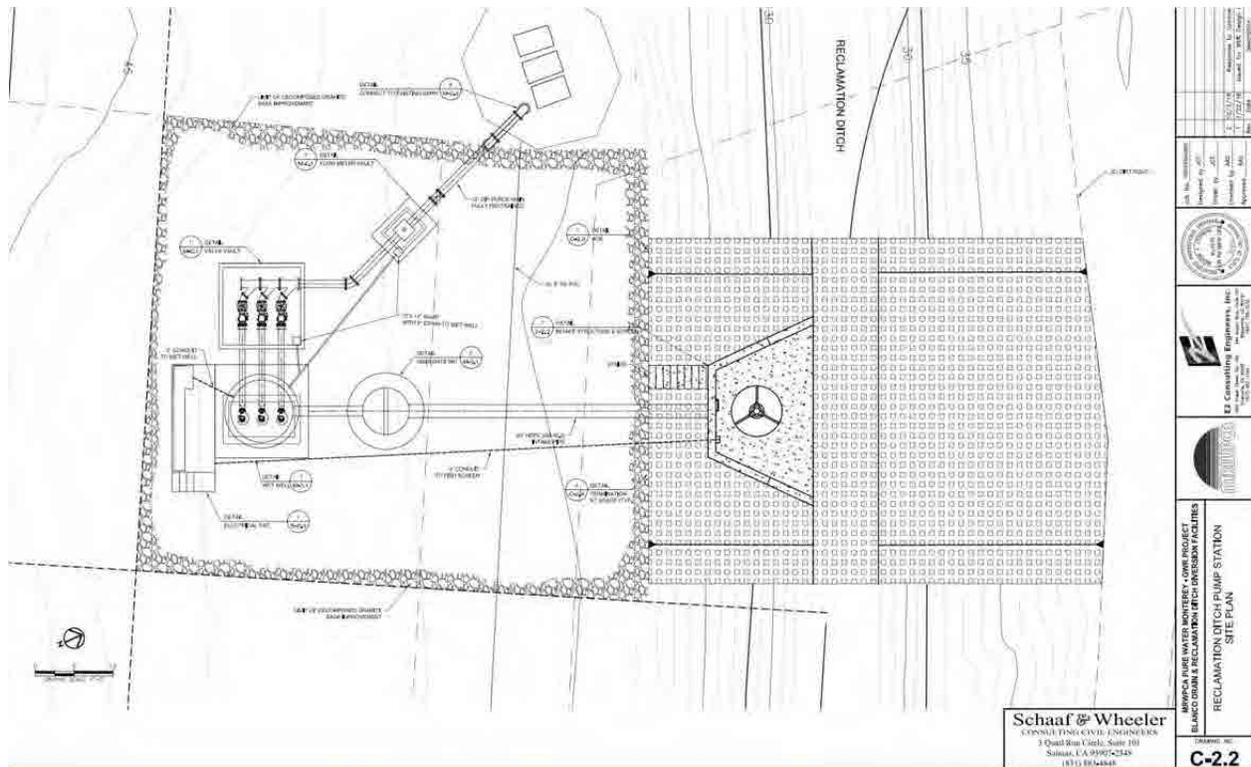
Design plan of the Reclamation Ditch diversion facility at Davis Road.
